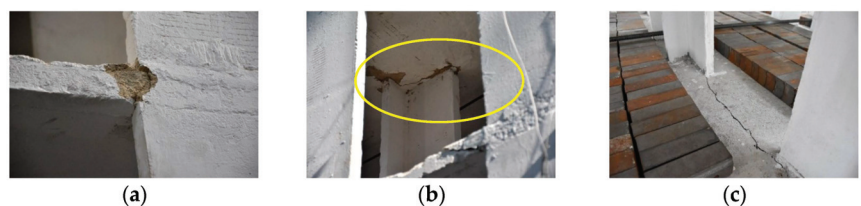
Damages after excitations of the rare level of intensity 8 (Phase IV): (a) crushing at the interface; (b) slab damages around a T-shaped wall; (c) a crack extending from one wall to another.
